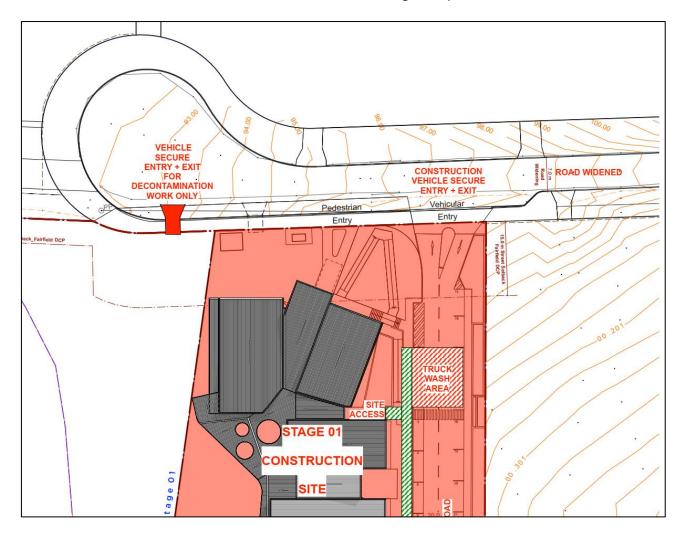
CONSTRUCTION ACCESS: STAGE 1
